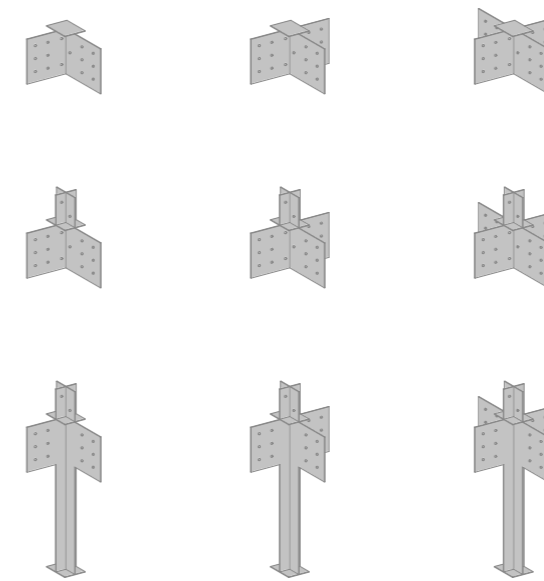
Drawing, Structure metallic connector. ©Personal illustration.
